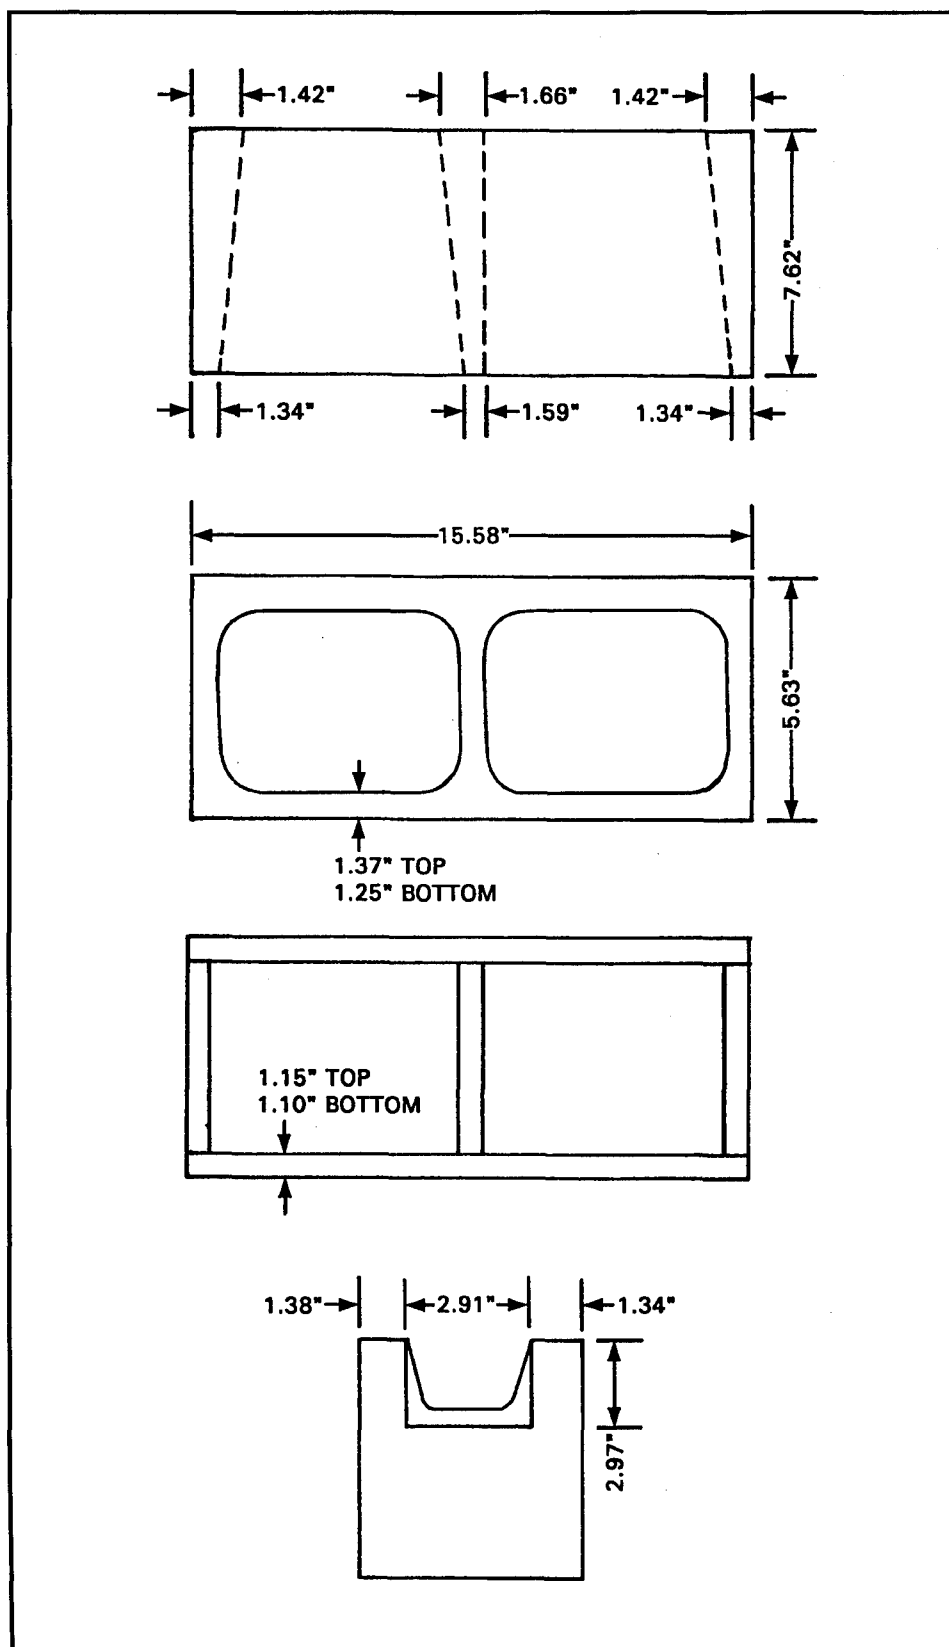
Typical elevation and cross section of 6-in. bond beam concrete masonry unit
